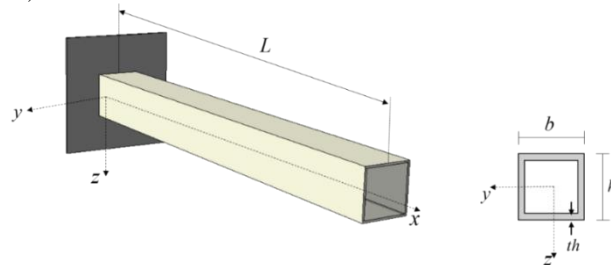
Rectangular hollow cross-section cantilever beam and cross-section
